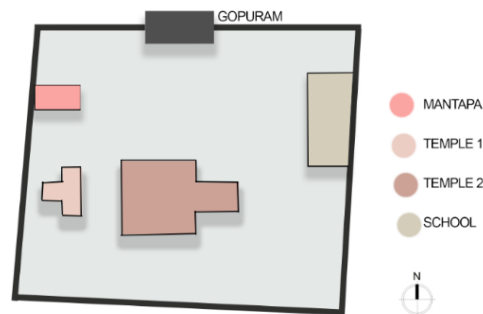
Site plan of Chenna Keshava temple, Kaidala
